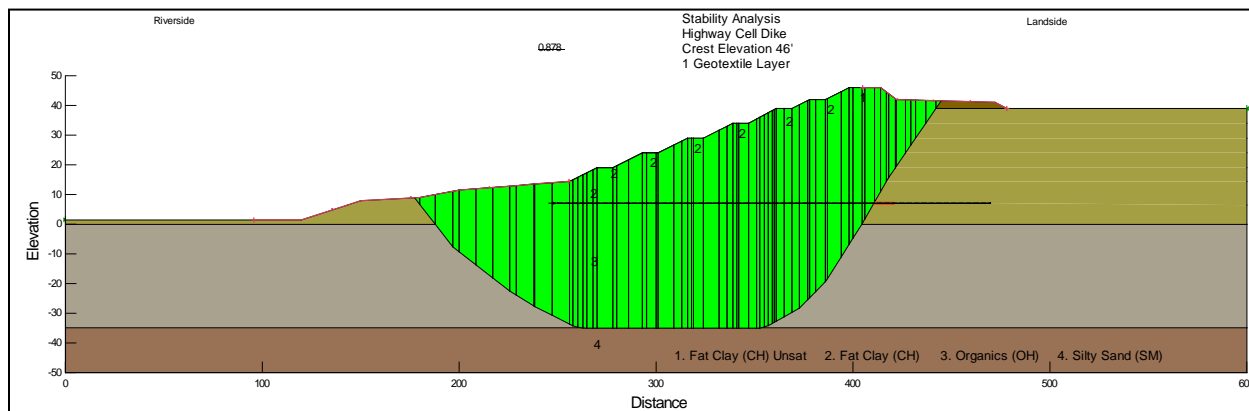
Highway Cell. Elevation 50'. 1 Geotextile layer. FS = 0.878
